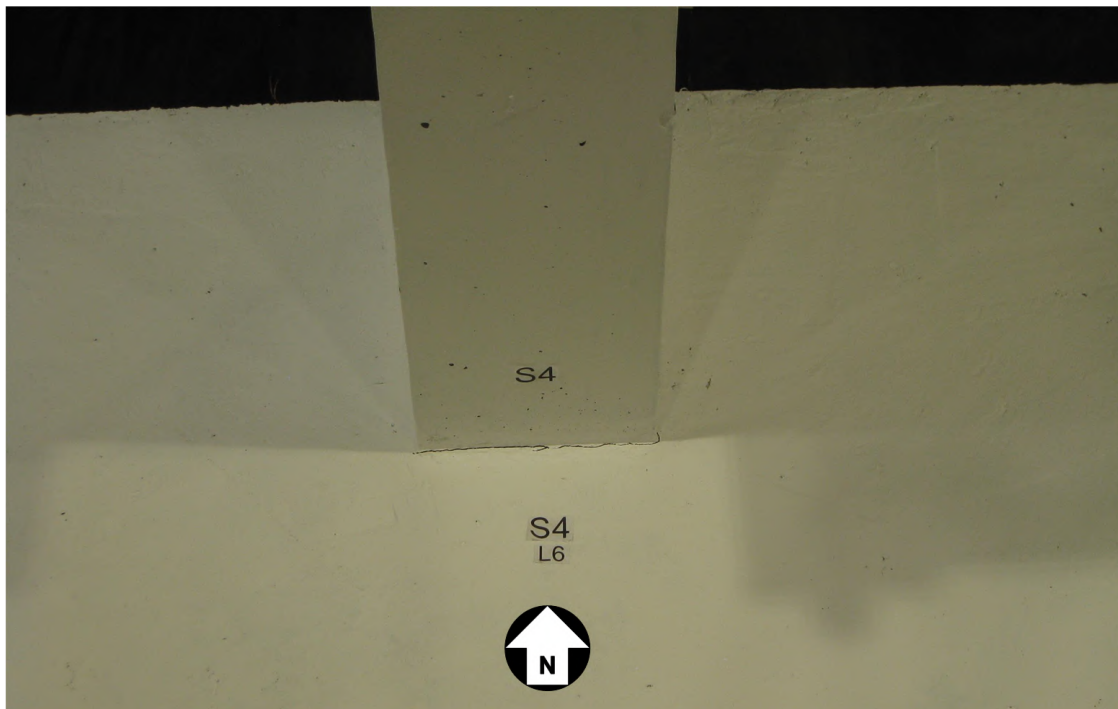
Specimen 4 slab cracks at $V = 76.0$ kN
